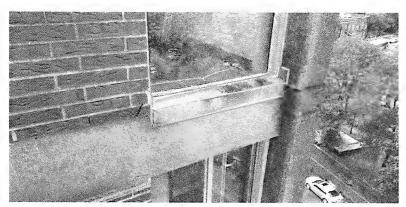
Cracked brick at west facade, eleventh floor
